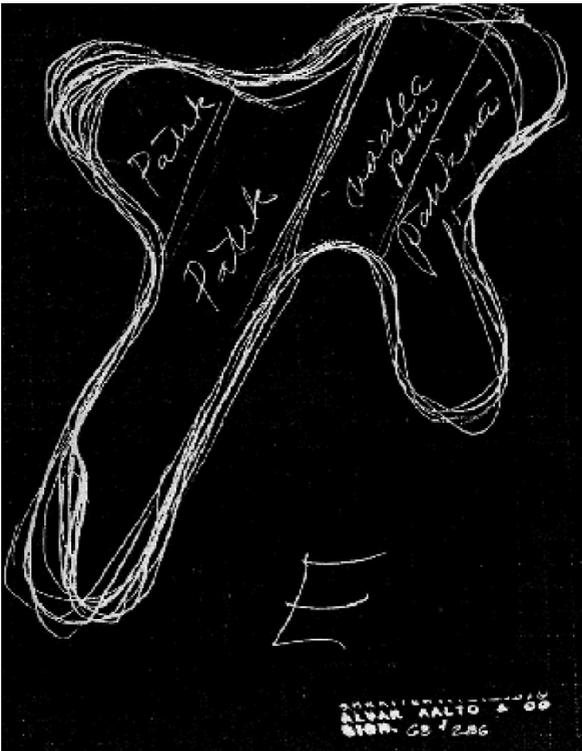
Detail of roof frame in Lapua Forest Pavilion. Source: Cristian Suau
